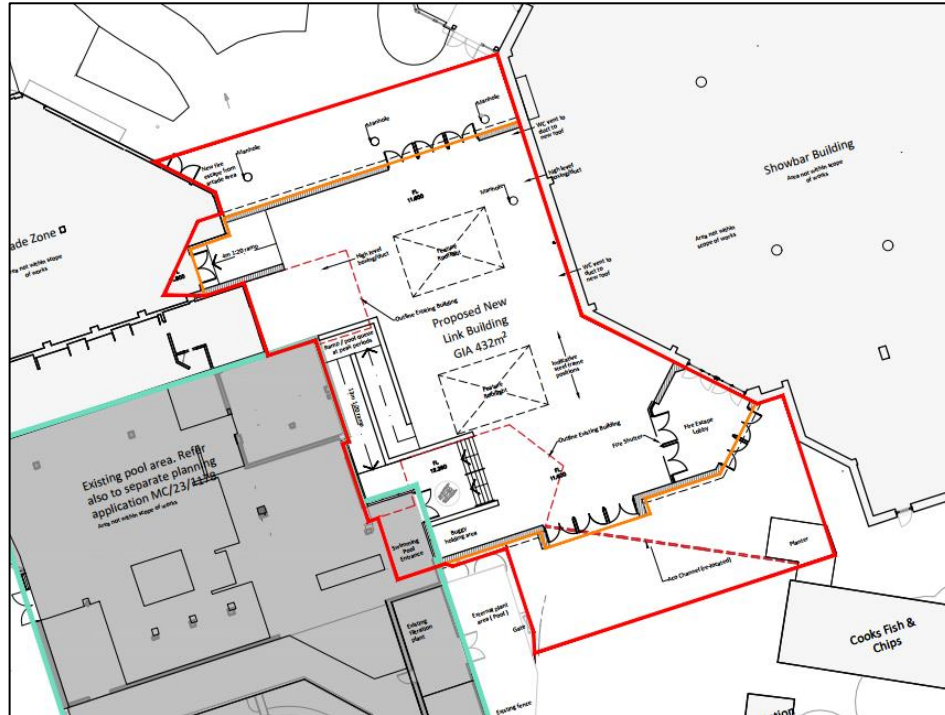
Development Proposals – full drawings within Appendix 1
